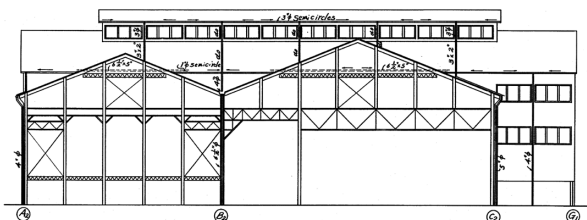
Drawing of No. 2 Plate Mill⁵⁾
